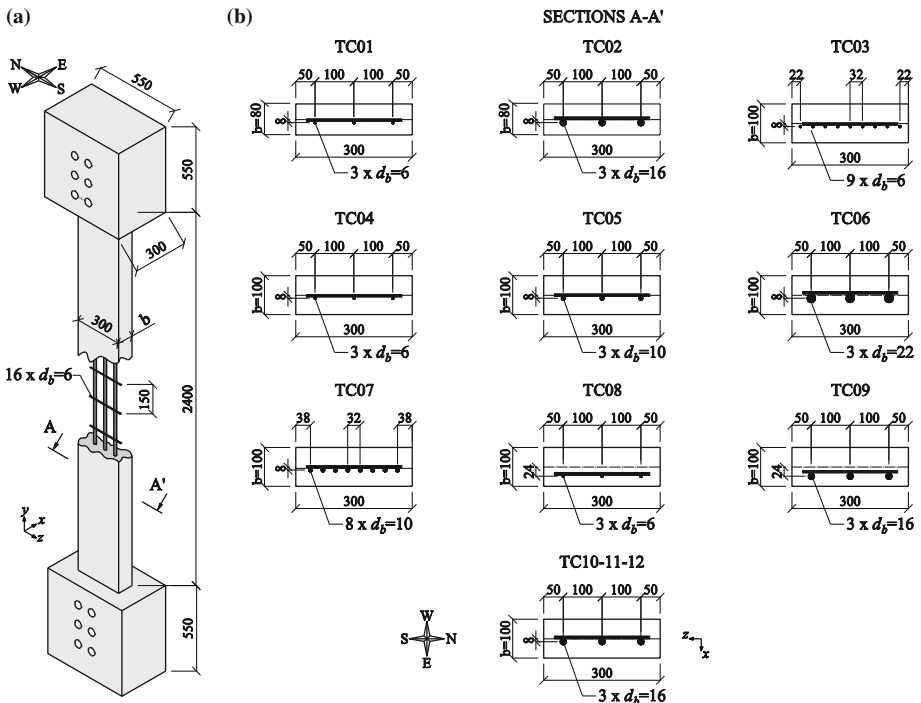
a 3D sketch of specimens TC10–11–12; b cross-section of all tested specimens (dimensions in mm)
